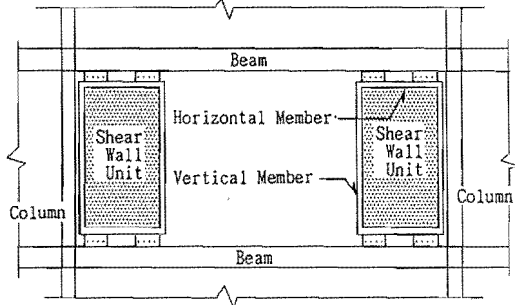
Setting of the Shear Wall Unit to the Structure Frame
